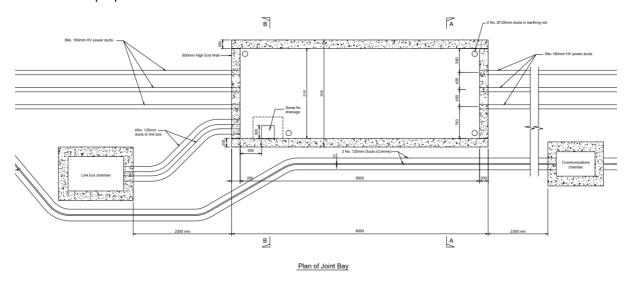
Typical plan of joint bay installation (Source: Mott MacDonald 229100591-MMD-01-XX-DR-E-2101) (Enclosure 8)
